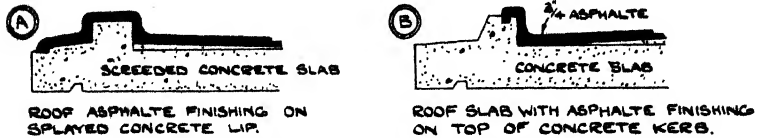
ASPHALTE FINISHES TO ROOF KERBS
